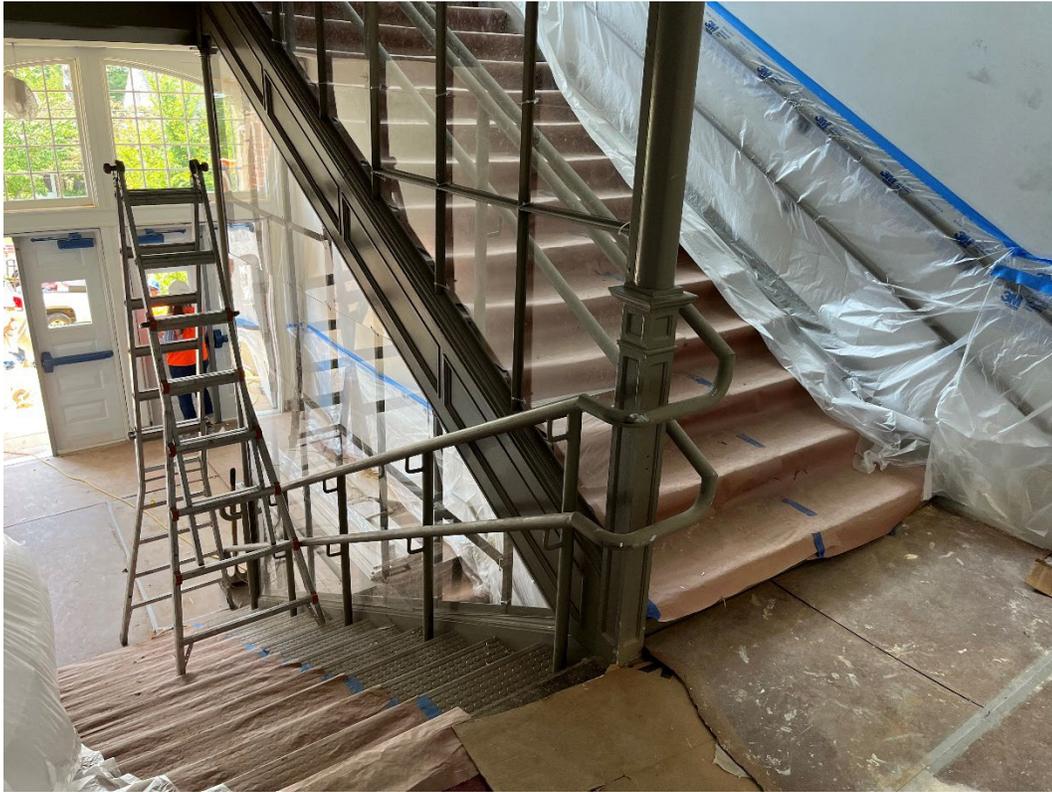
DC_Randle Highlands School_0011.tif: West Stairwell, Looking West
